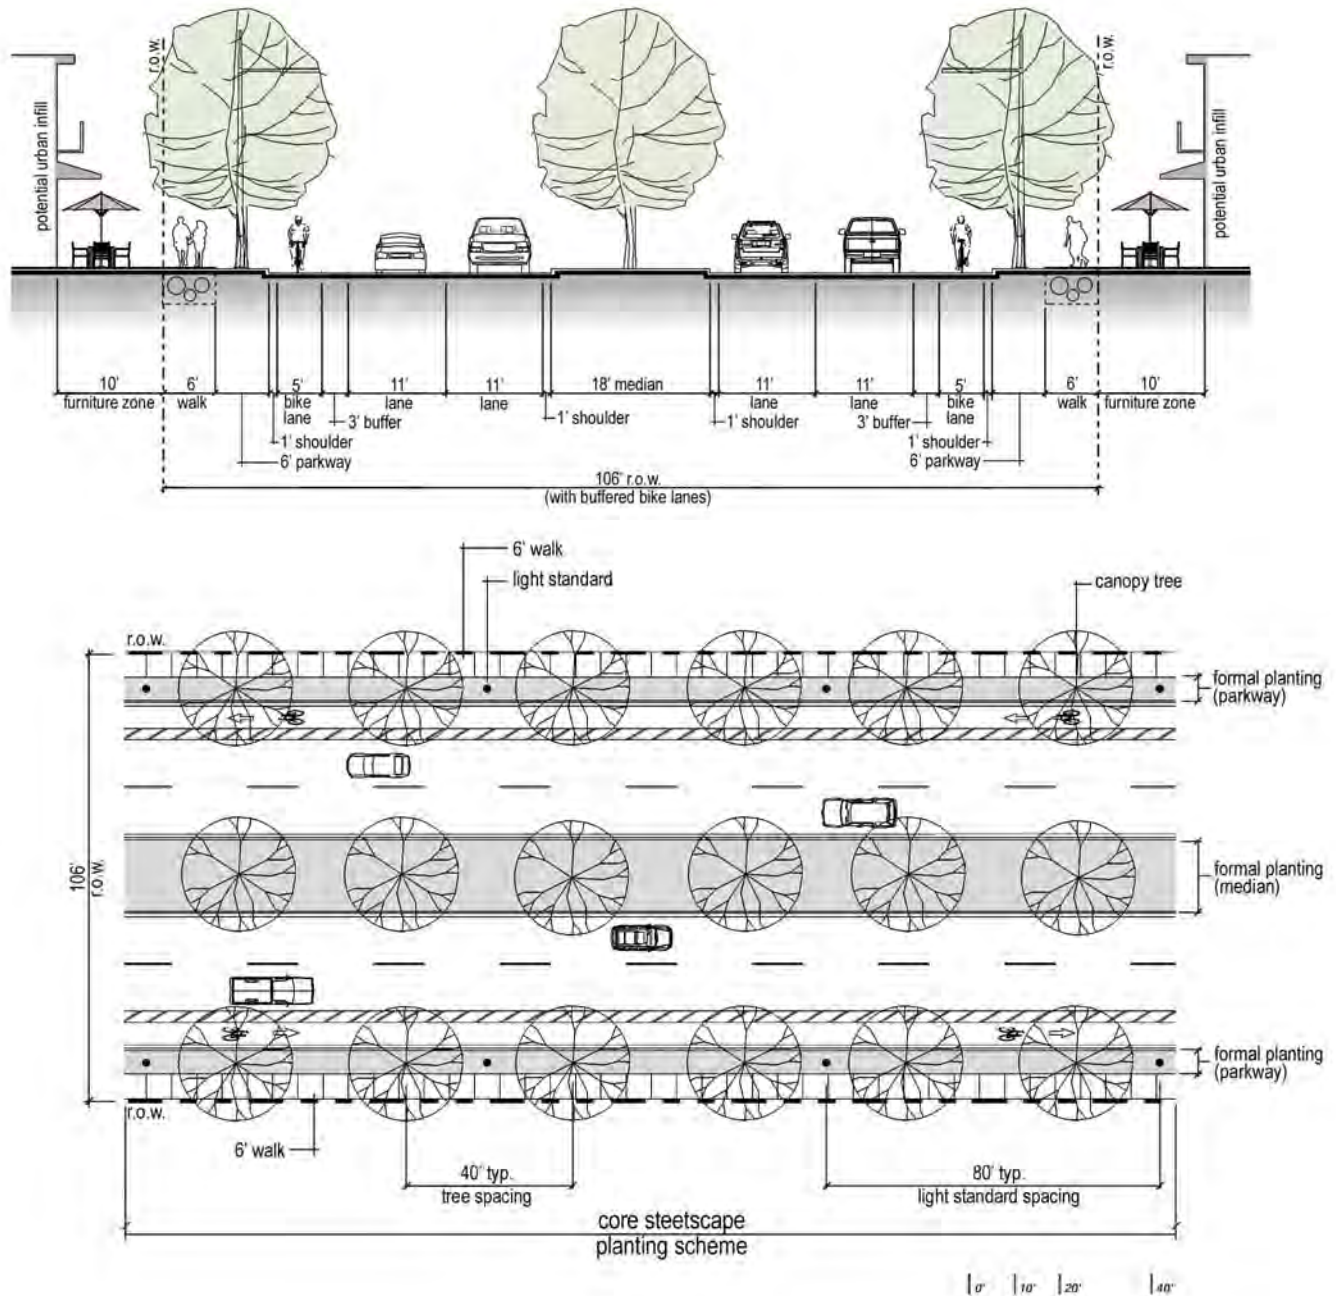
Typical Core Arterial Section & Plan: Minor Arterial
